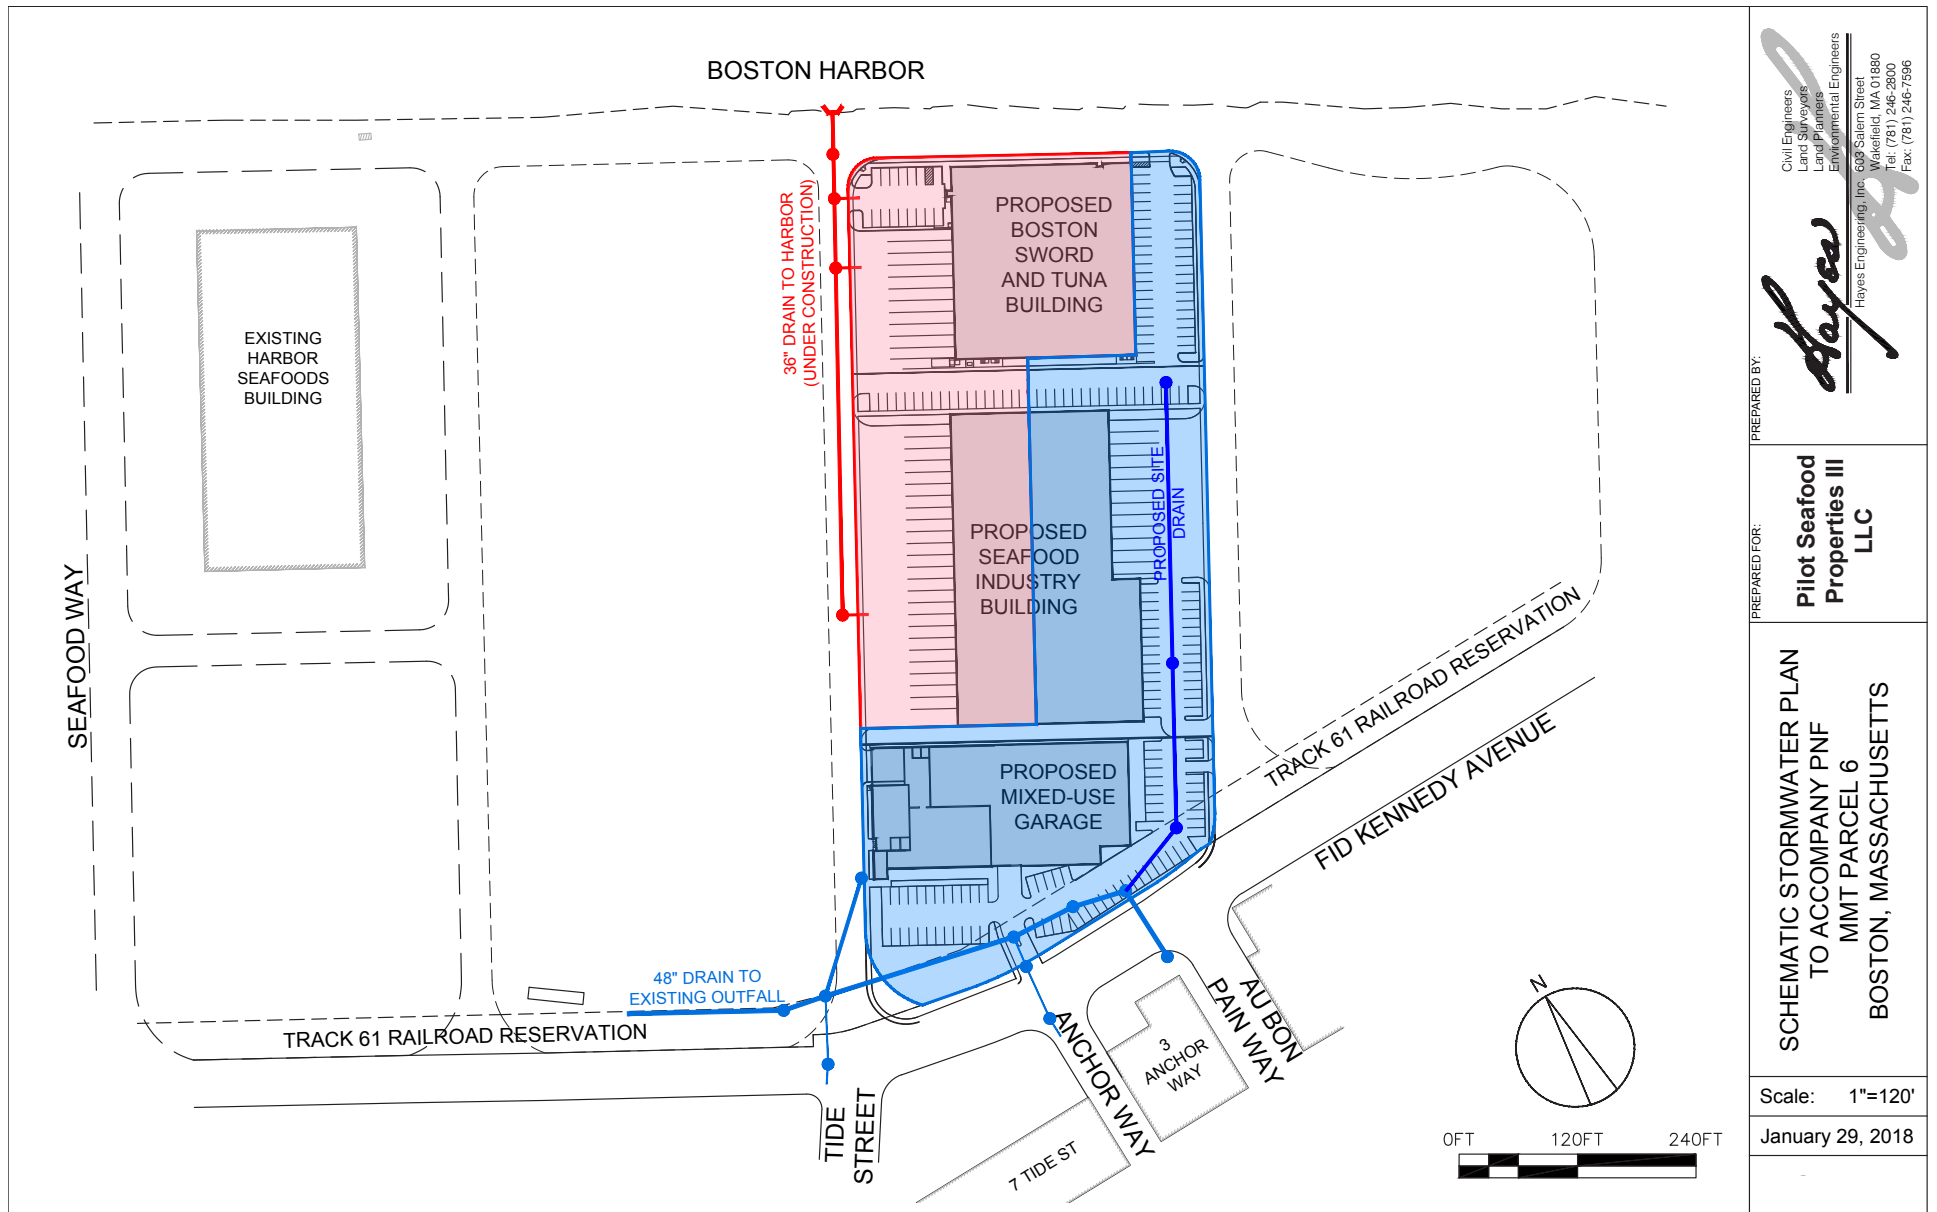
Schematic Stormwater Plan- Parcel 6
